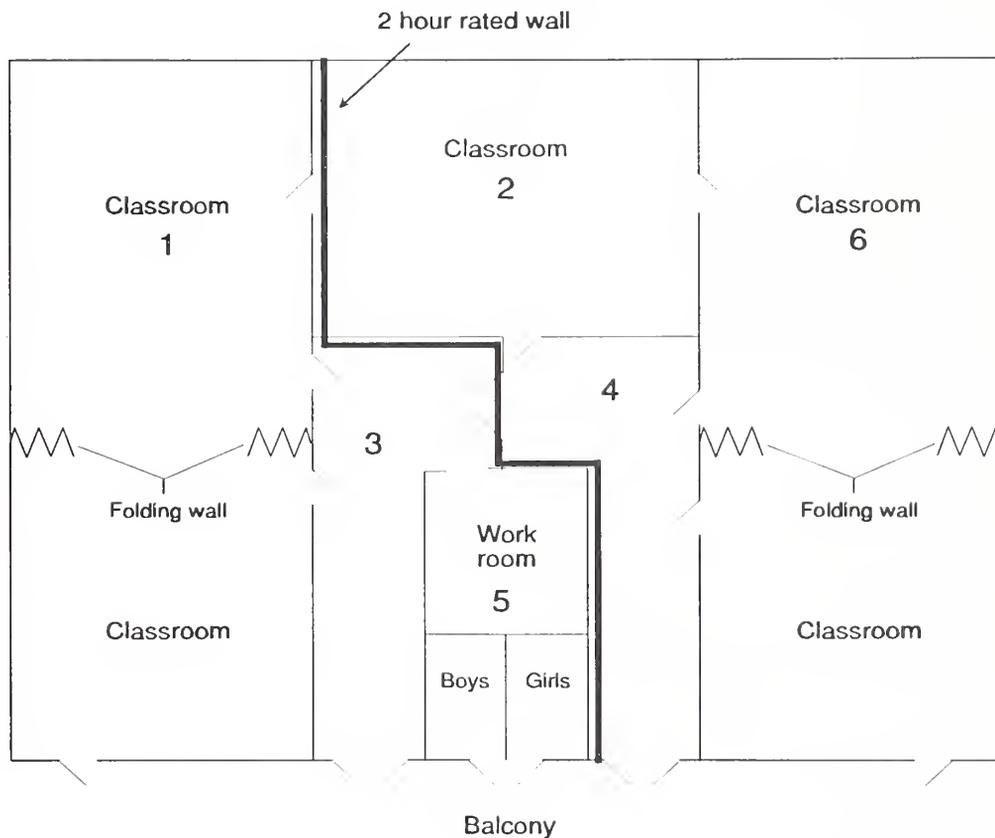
Floor plan of a school building used in a hazard analysis of code alternatives.
